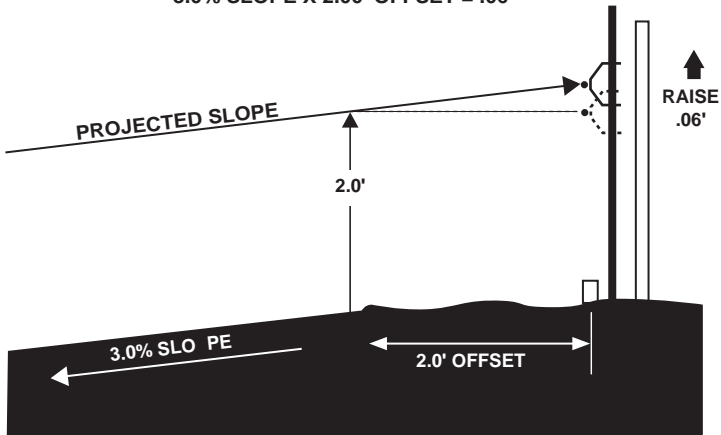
Raise Stringline: 3% Cross Slope with 2 Foot Offset
